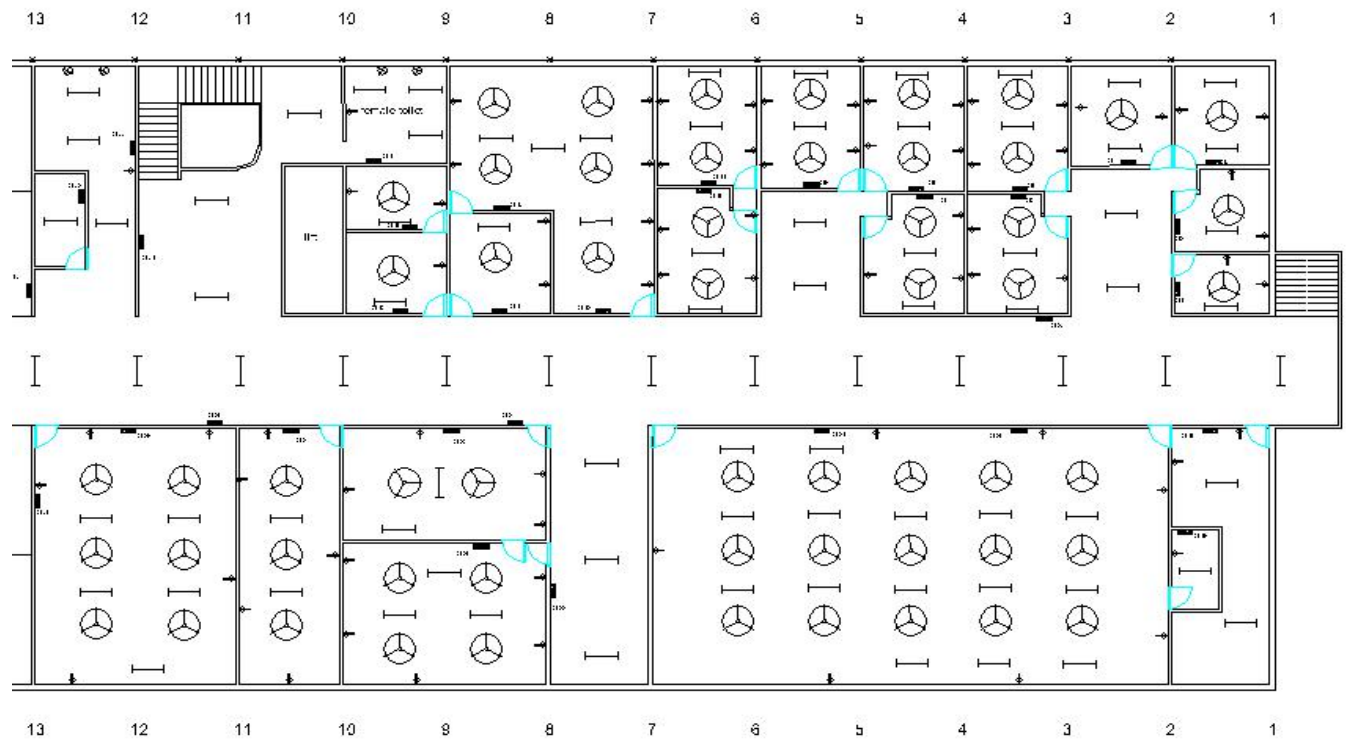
fittings and fixture layout for eastern part of academic building 8th floor
